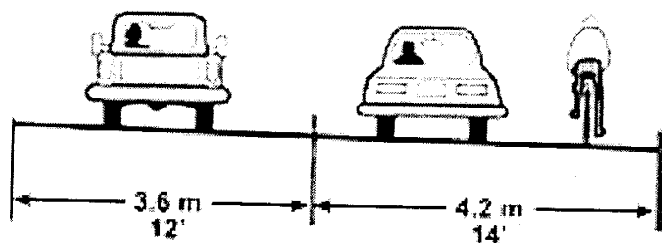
Cross-section of a wide curb lane (Source: Oregon Department of Transportation)
